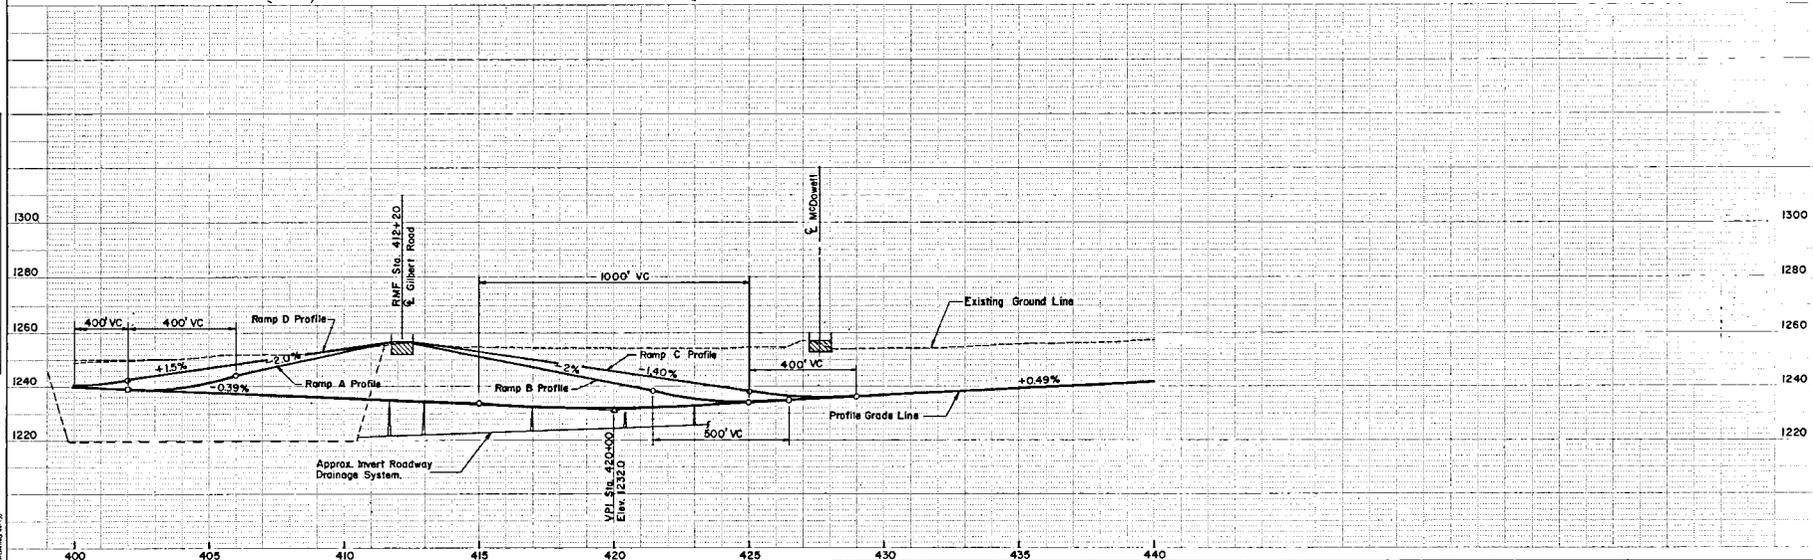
SHEET 1 PLAN - PROFILE - DOTTED
